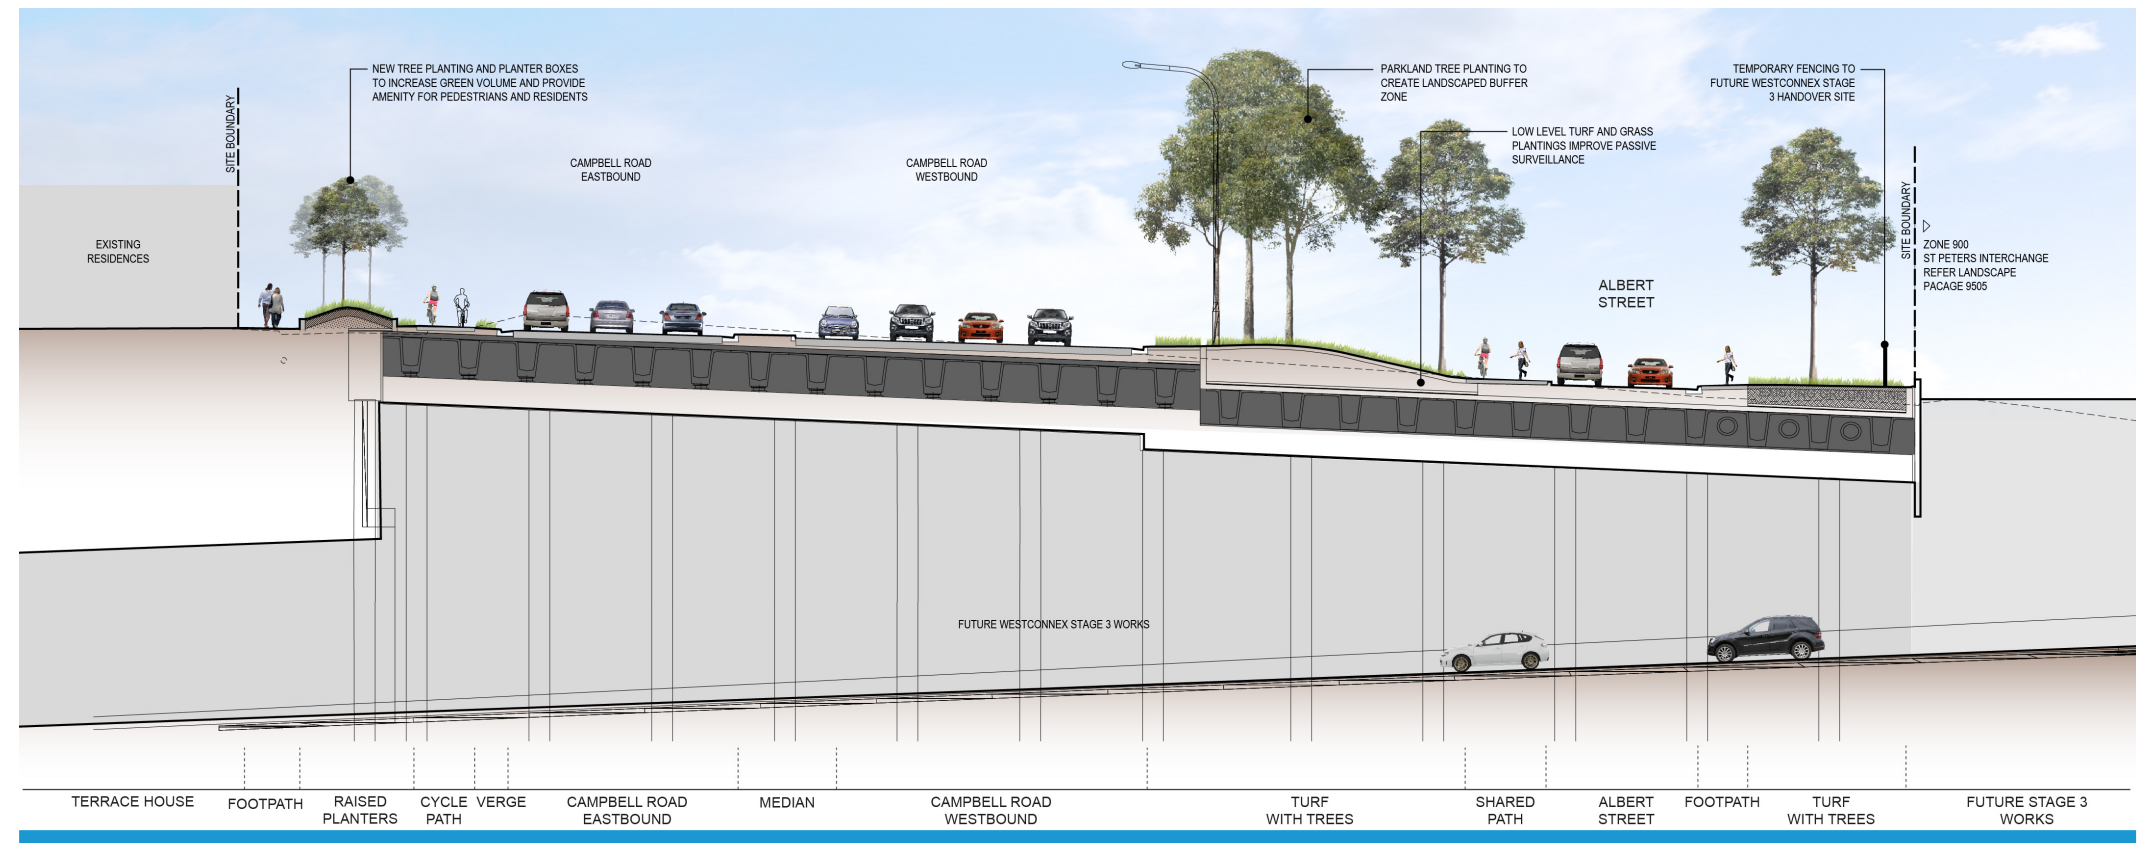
Campbell Street Green Link - Typical Cross Section - Campbell Road CH675 (M7Q0) - 1:250
